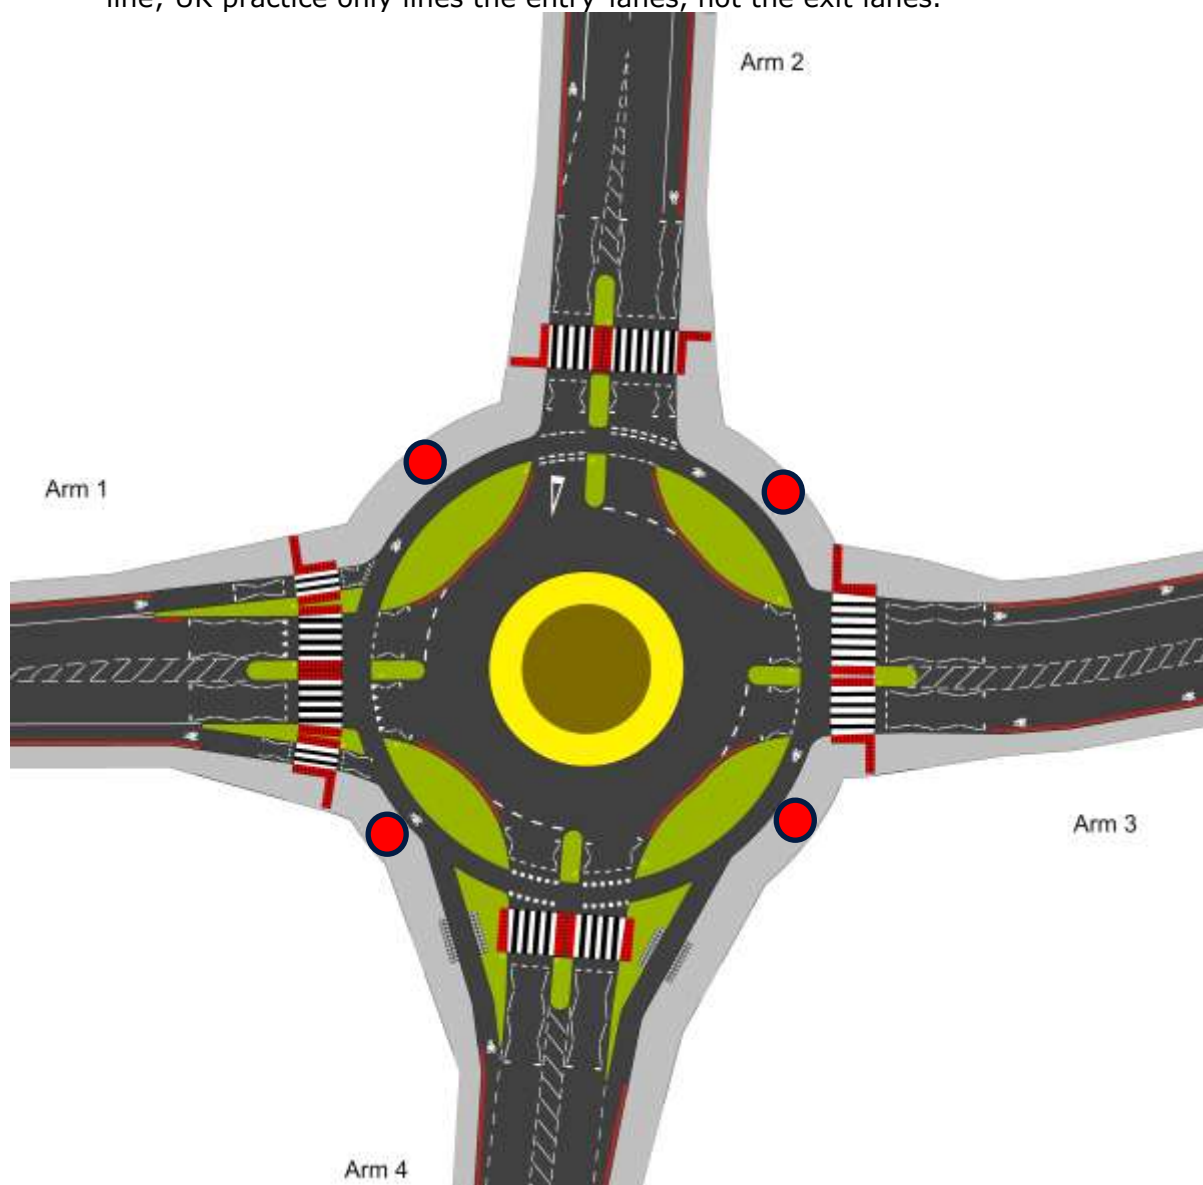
Layout of the Dutch-style Roundabout with UK road markings
